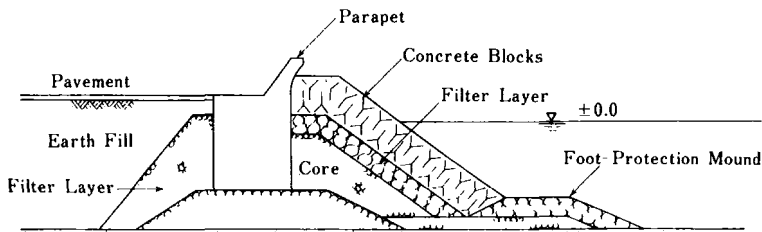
Idealized typical section of a seawall built with concrete block mound of the energy-dissipating type.
